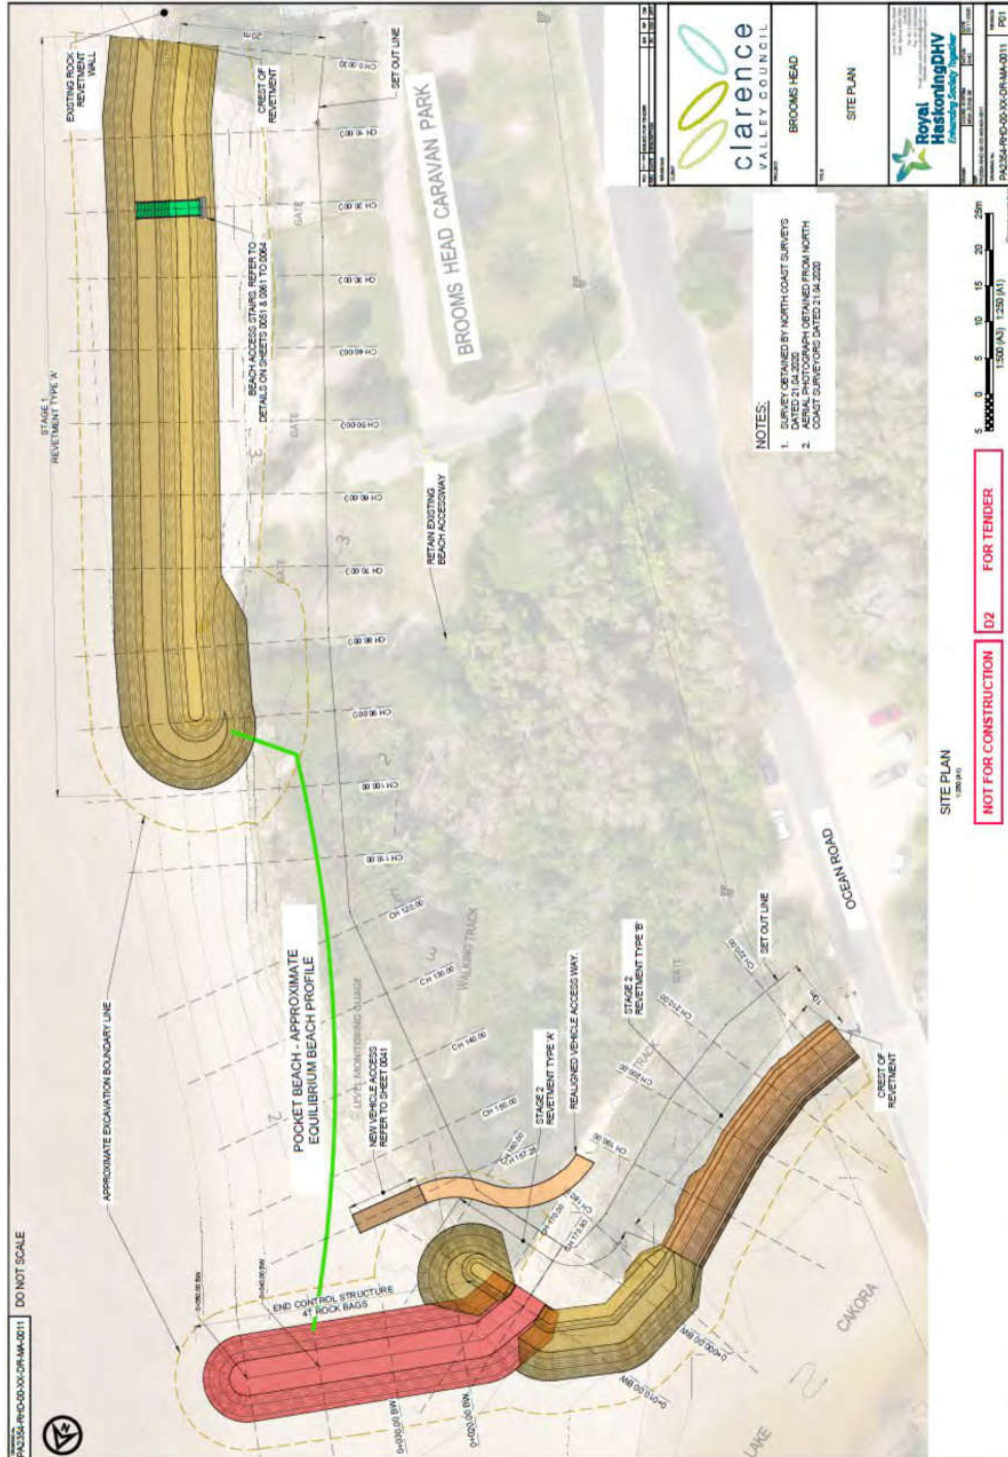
Brooms Head revetment extension - stage 1 and 2 site plan
